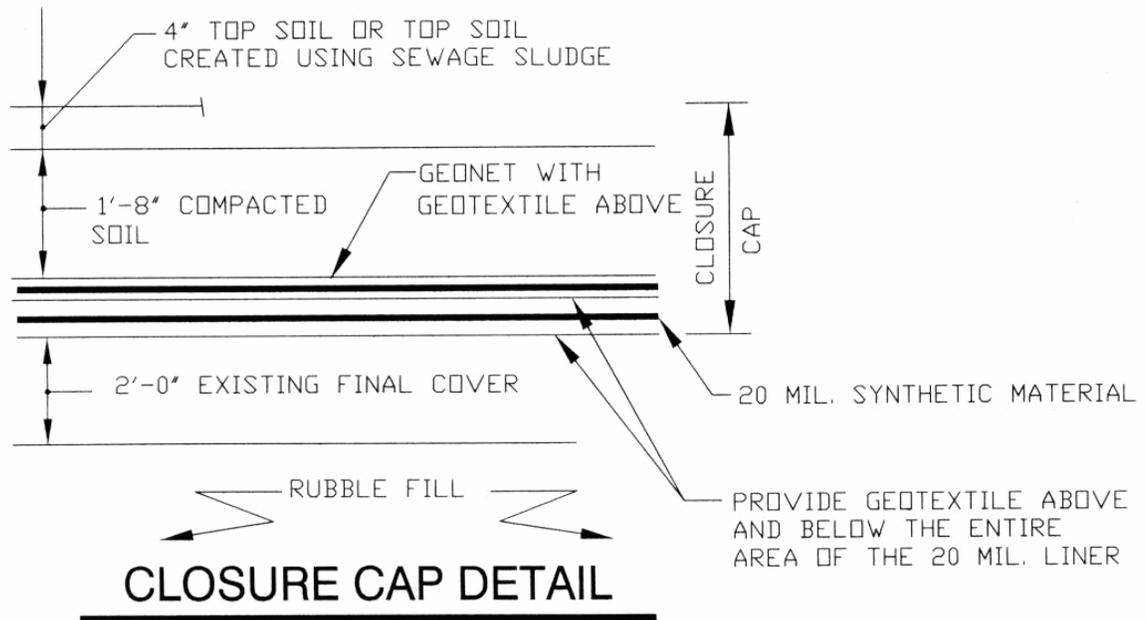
Original final cover system design from Plan Sheet C-9 with unbonded nonwoven geotextile below the drainage net.
